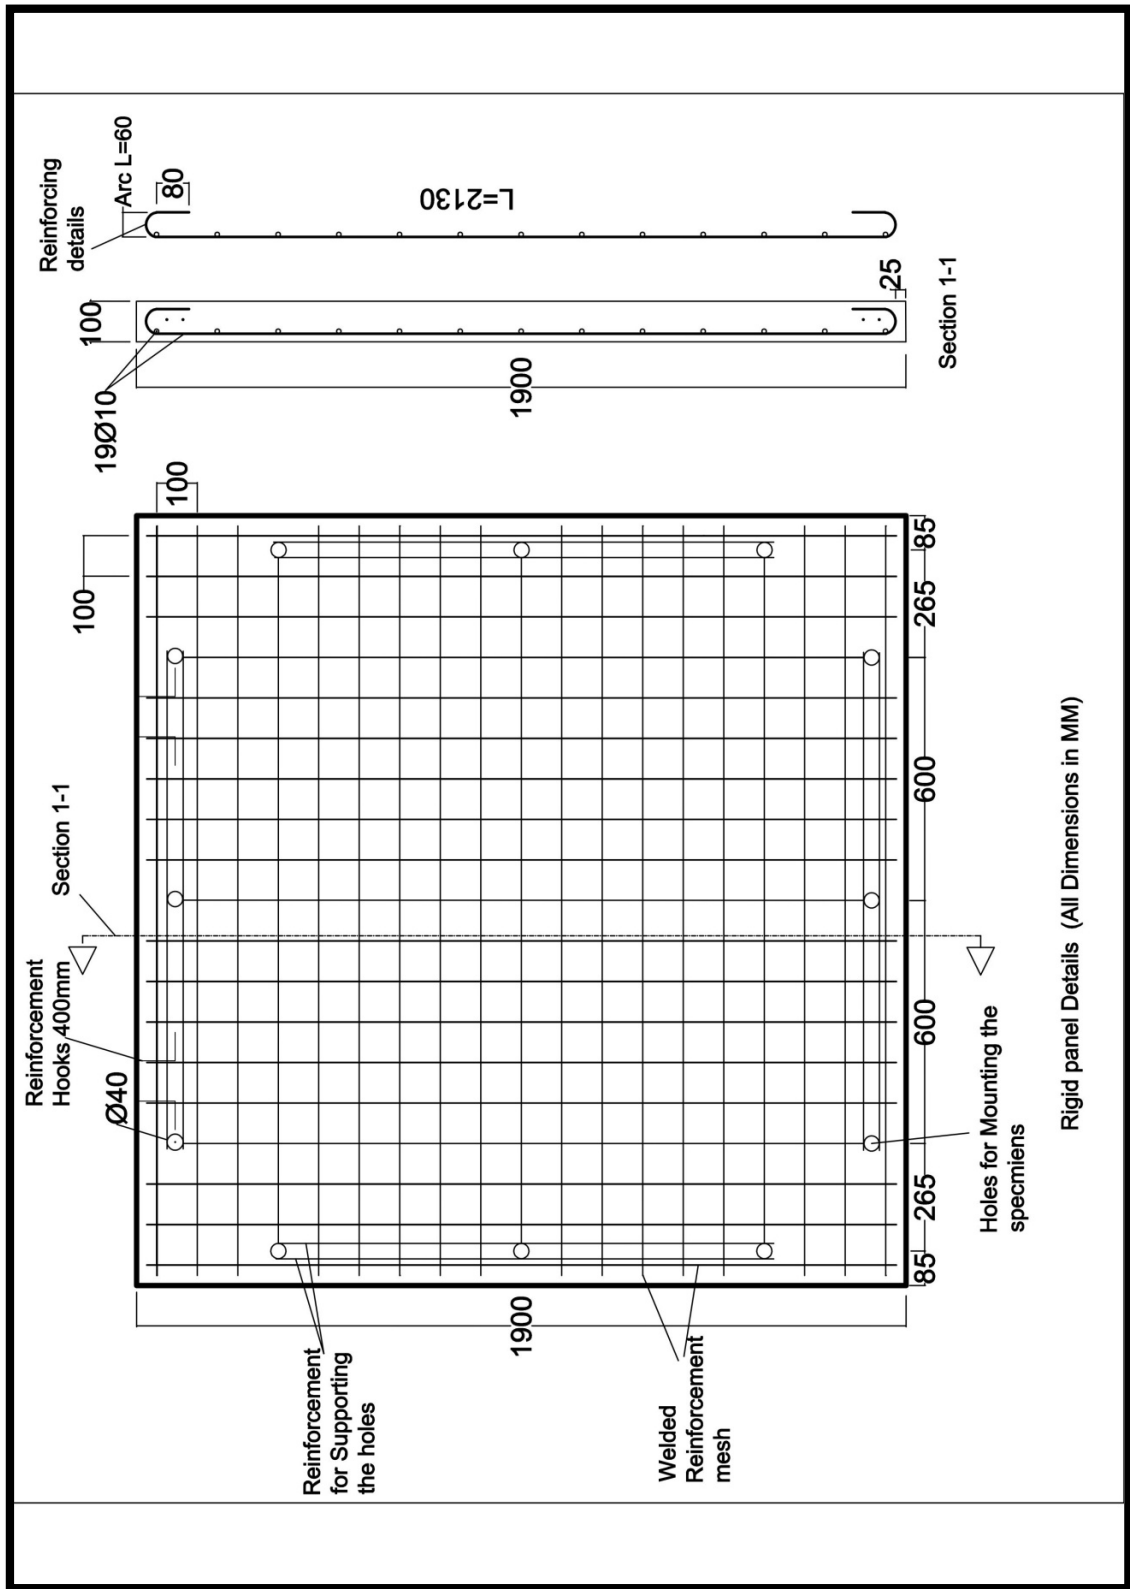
Rigid Panel Details (All Dimensions in mm)
